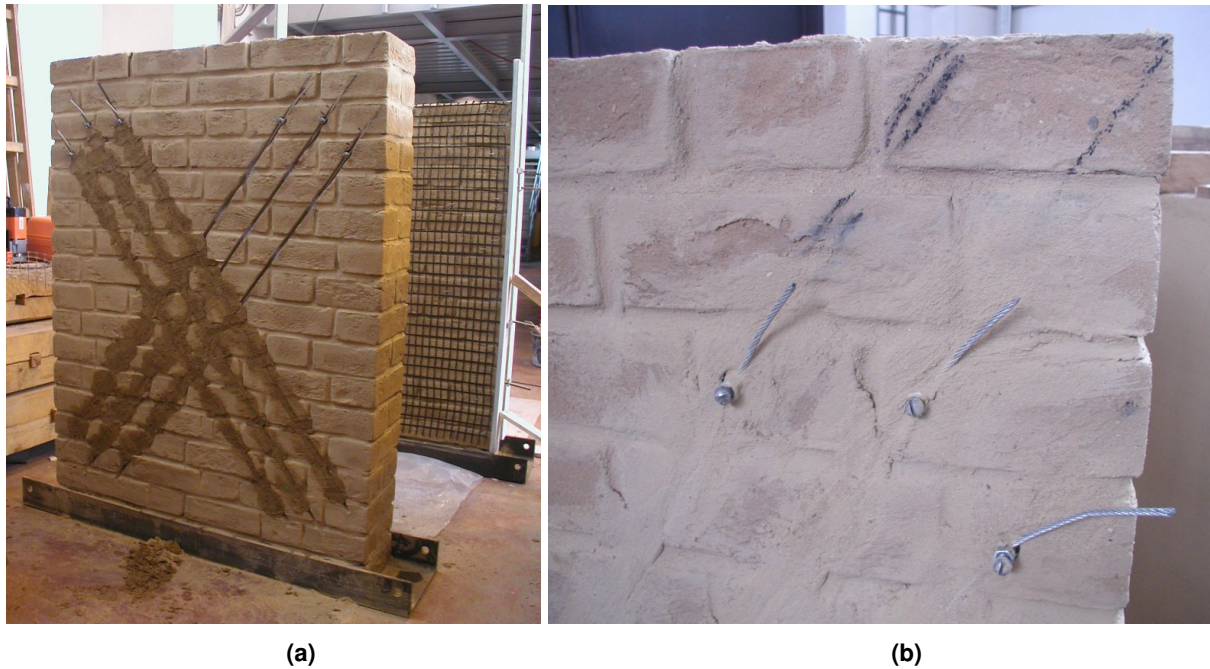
Adobe brick wall reinforced by means of X-shaped wire ropes (a) and detail of the anchoring system for wire ropes (b).
